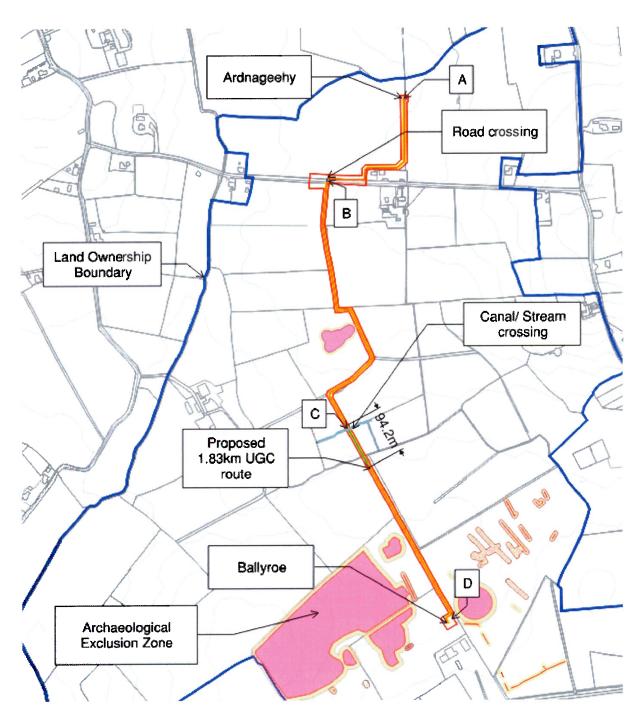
Interconnector Route Location Ardnageehy to Ballyroe
